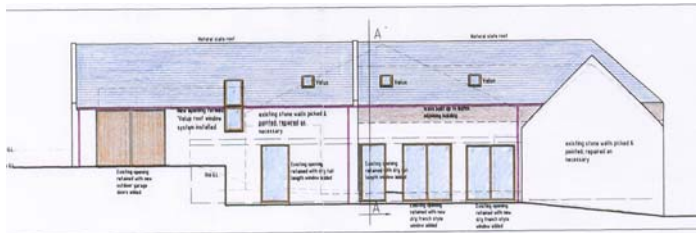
Originally proposed eastern elevation (front of Property 2).
